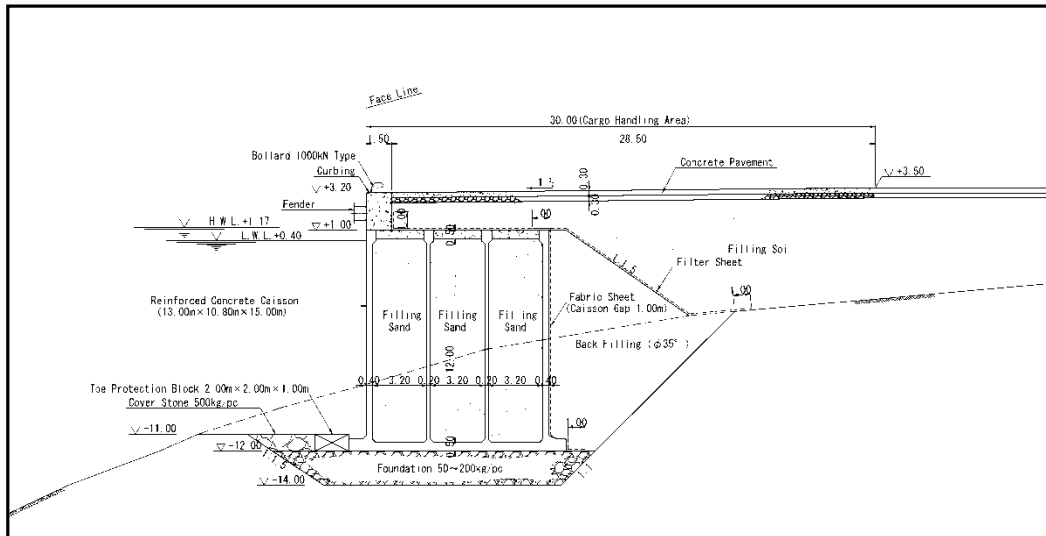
Cross Section of Concrete Caisson Type Structure
